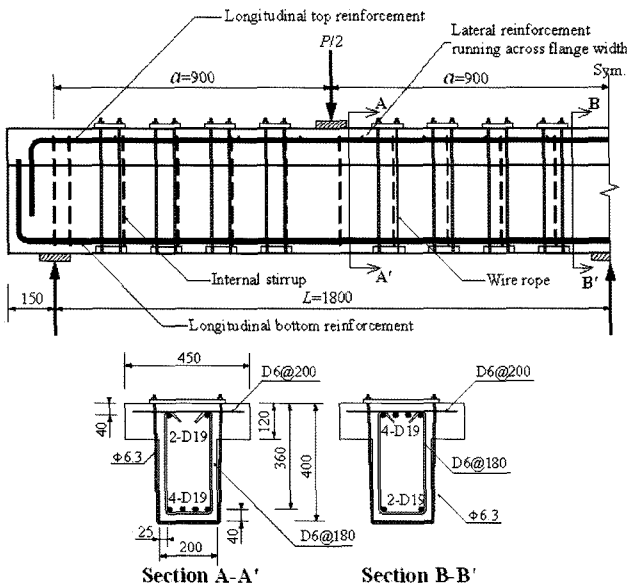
Details of specimens and arrangement of reinforcement and wire rope units (unit: mm)
